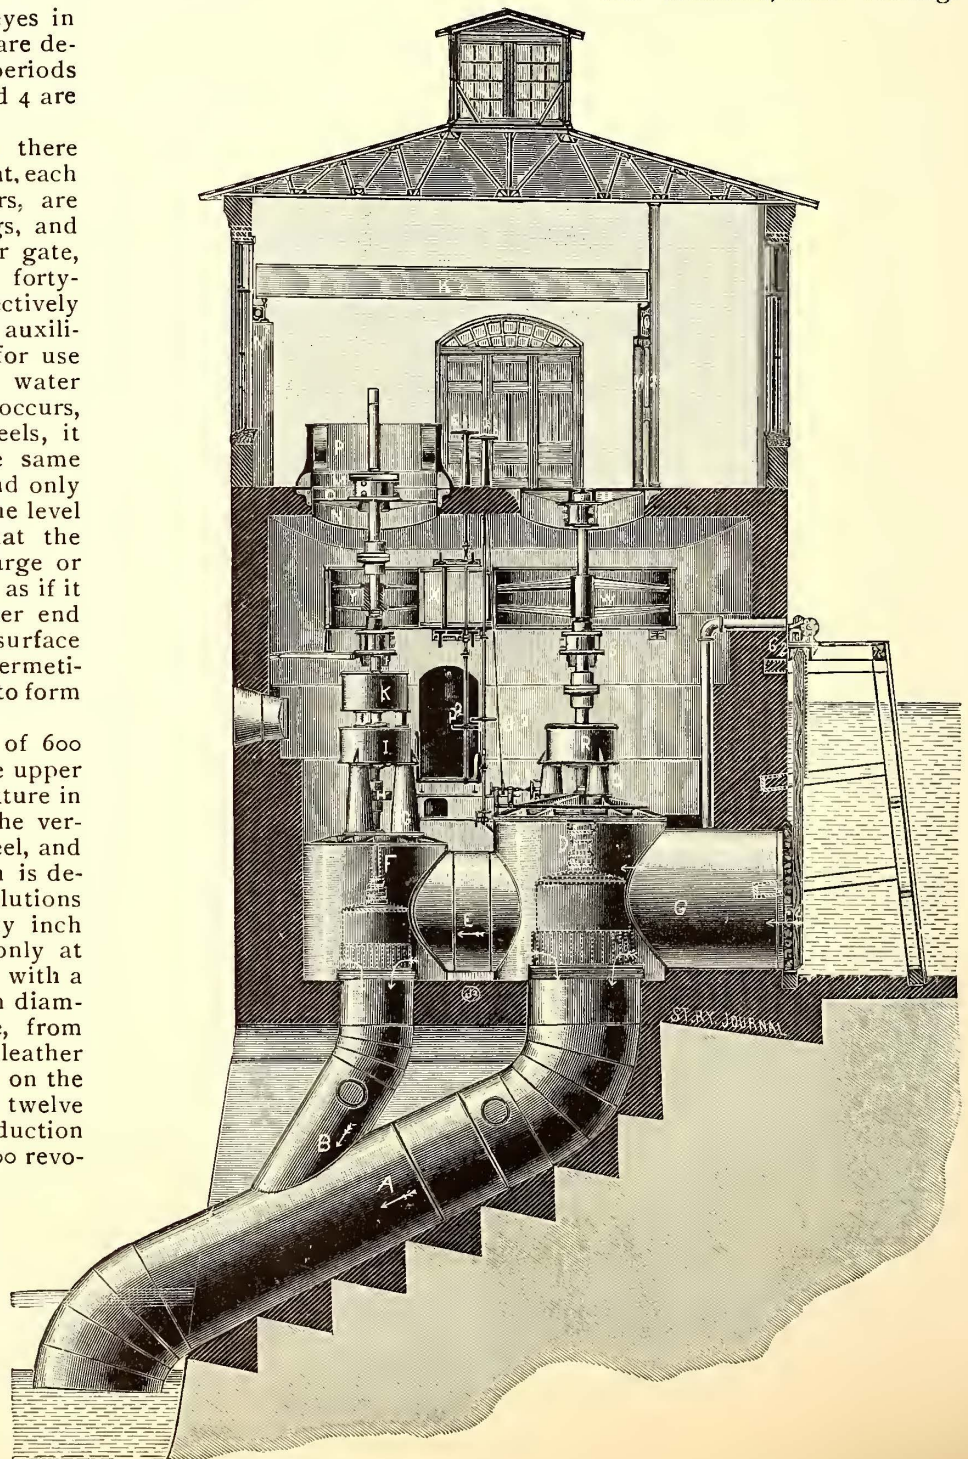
SECTIONAL ELEVATION OF 42-INCH AND 60-INCH WHEEL ROOMS, LOOKING UP STREAM—PORTLAND, ORE.
